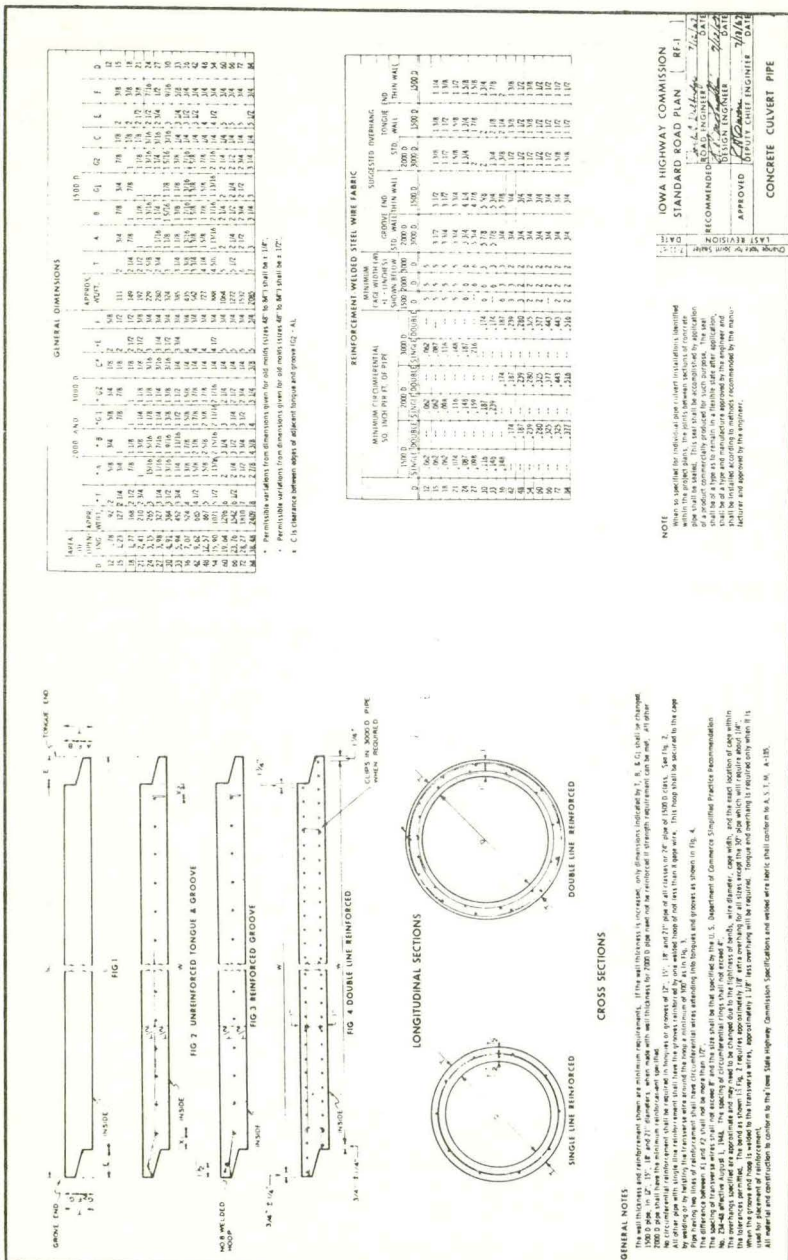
Pipe culvert standard plans 1404 and 1502.
